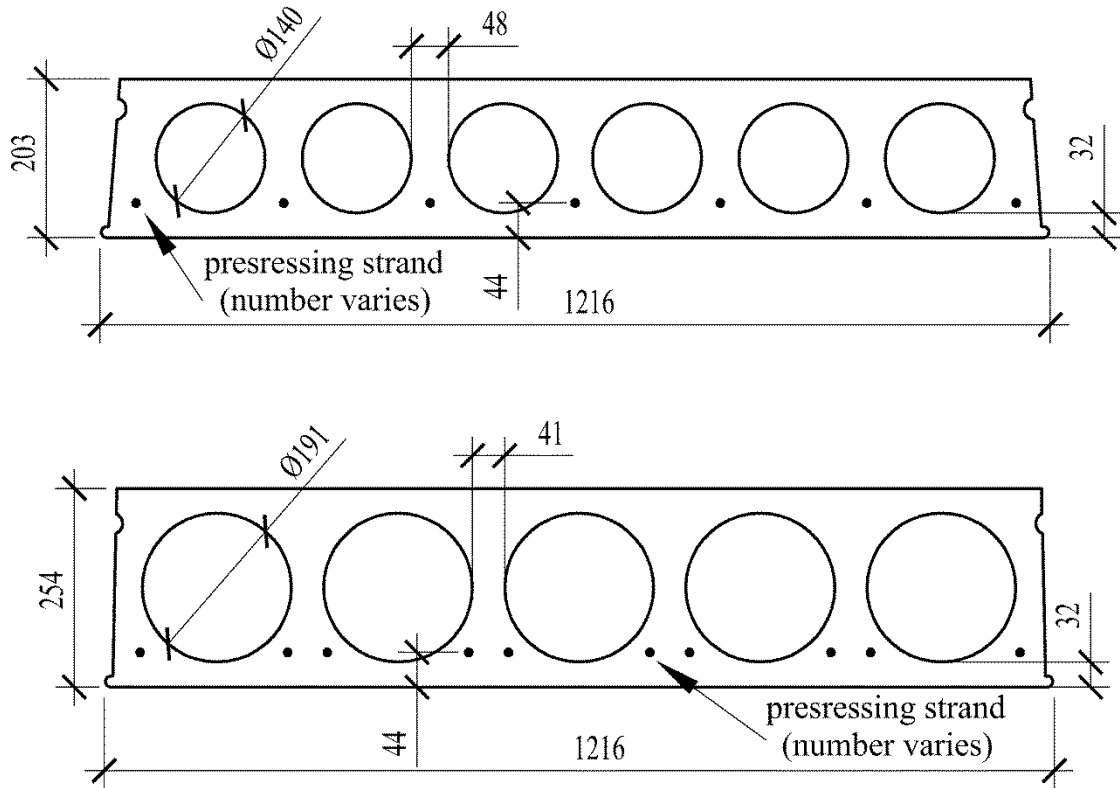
Typical cross-section of the tested hollowcore slabs.
